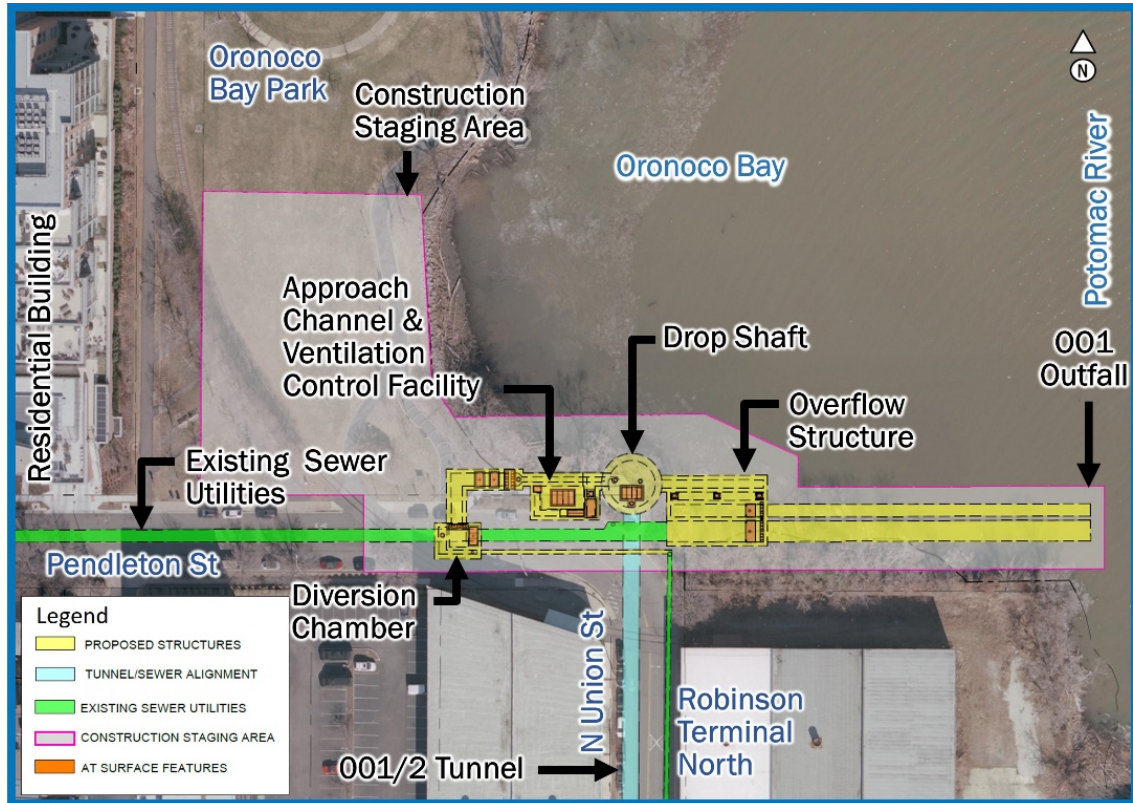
Outfall 001 Diversion Facility (OBE Alternative)
